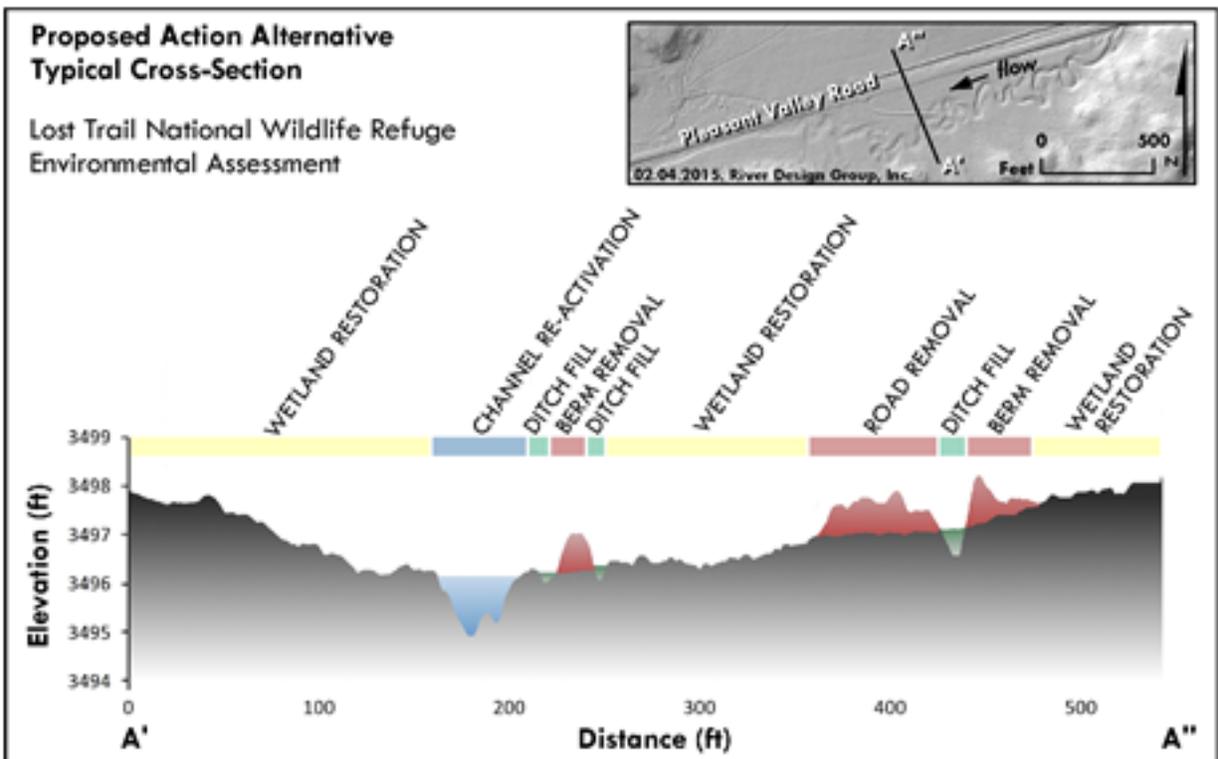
Typical cross-section illustrating Proposed Action Alternative design concepts.
